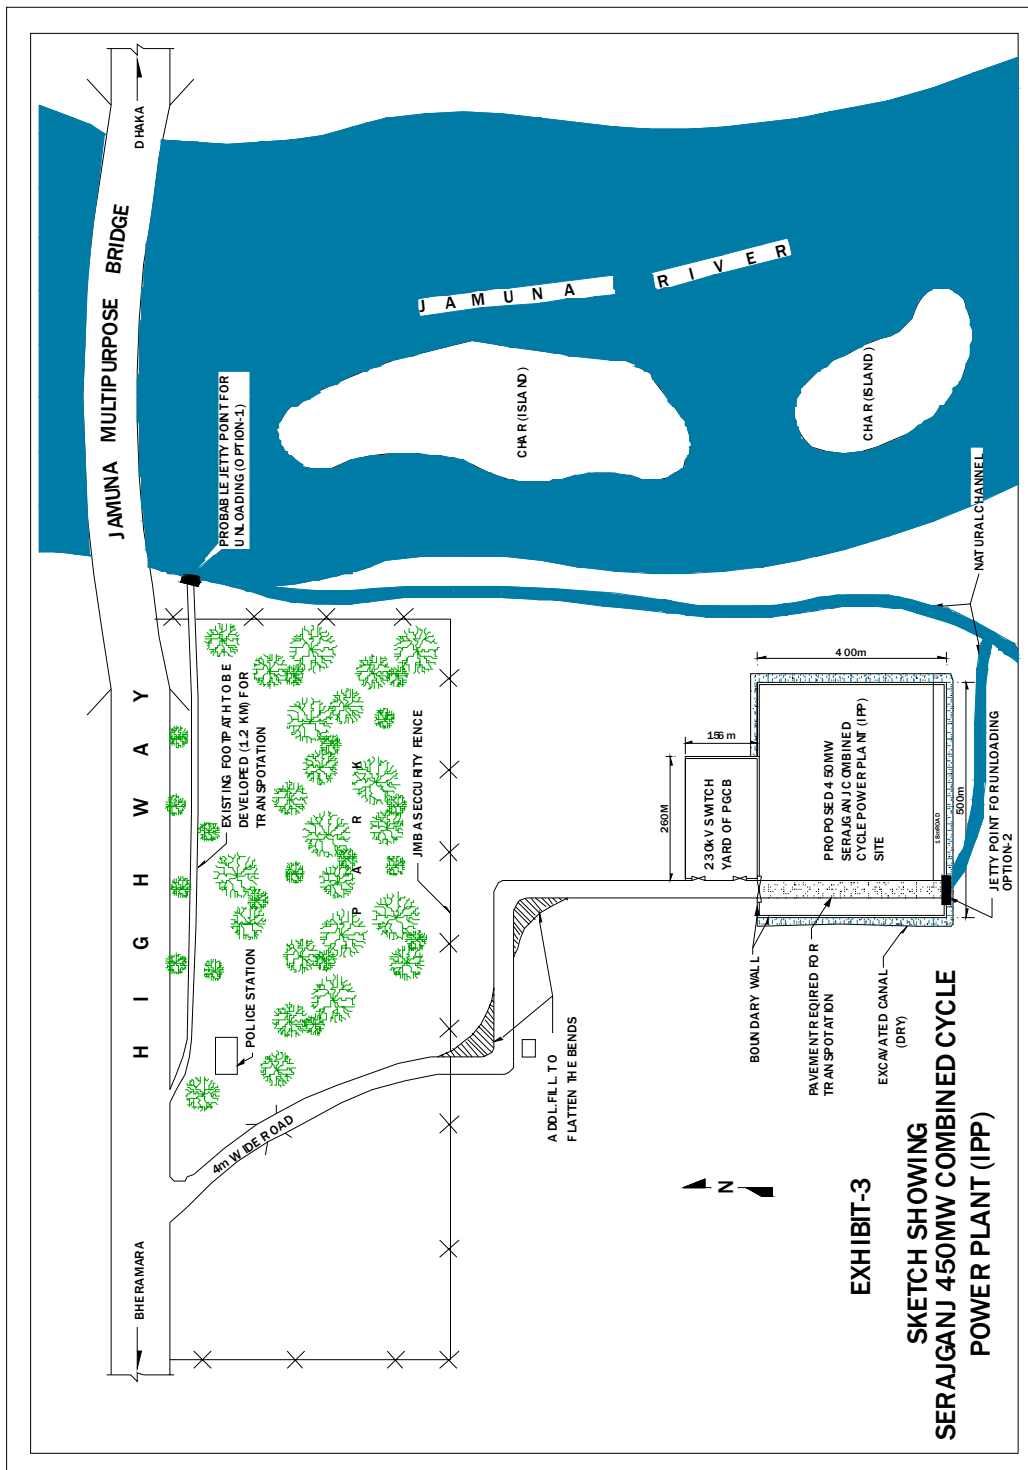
Candidate jetty positions in Sirajganj site
